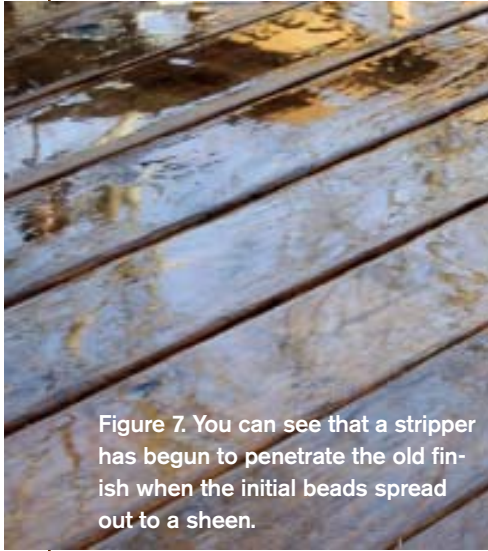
You can see that a stripper has begun to penetrate the old finish when the initial beads spread out to a sheen.
